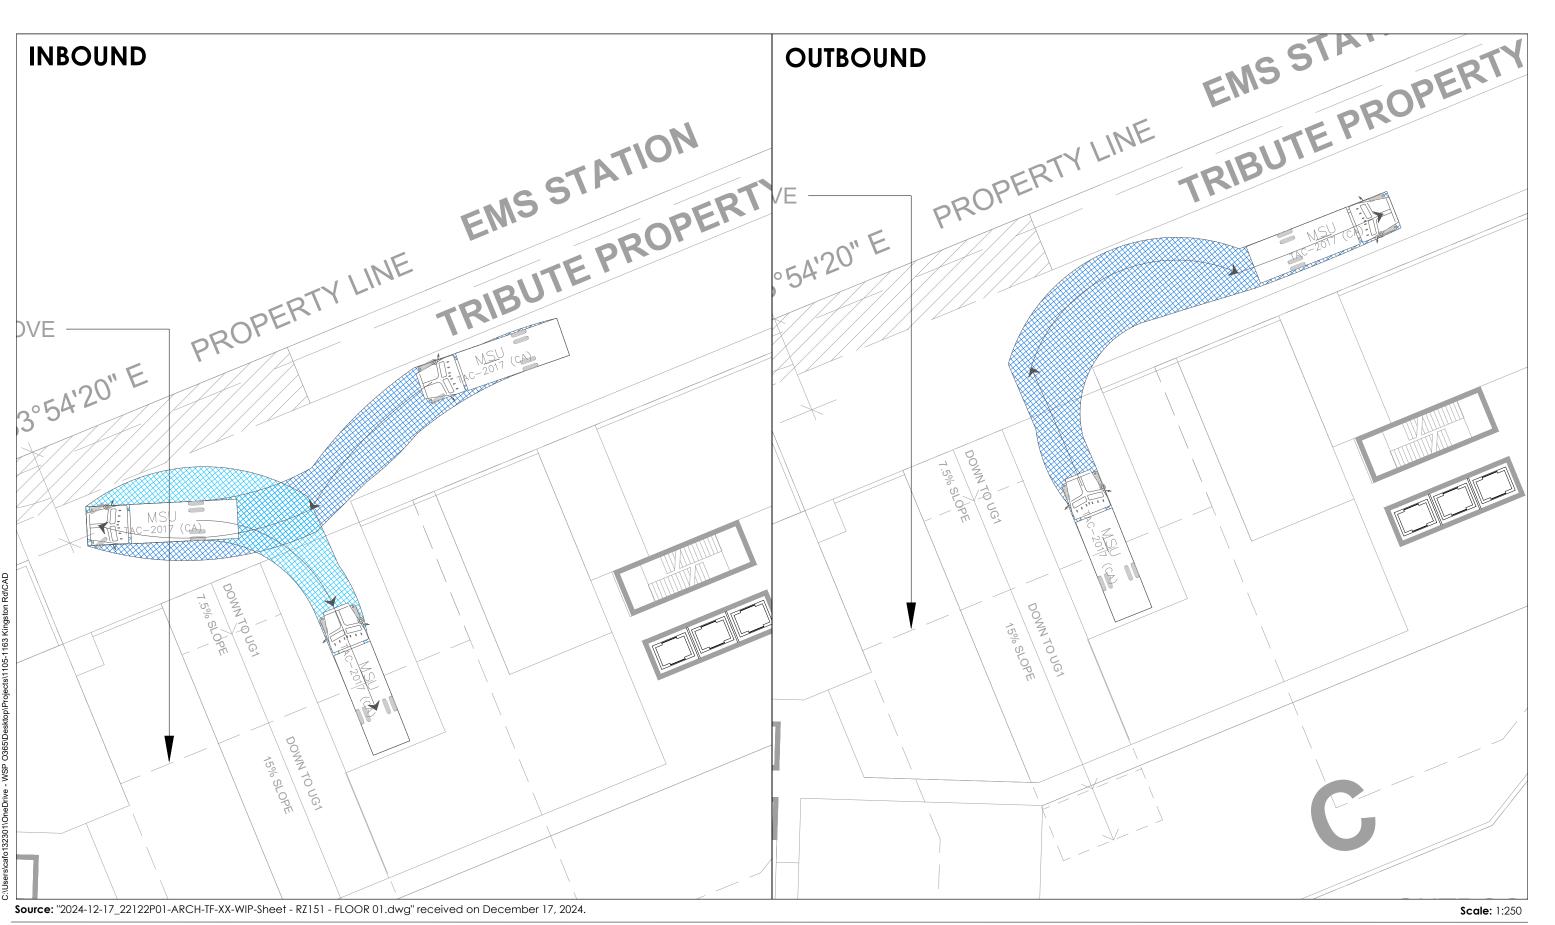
MSU Loading Truck Turning Maneuver - Building B 1105-1163 Kingston Road, Pickering
